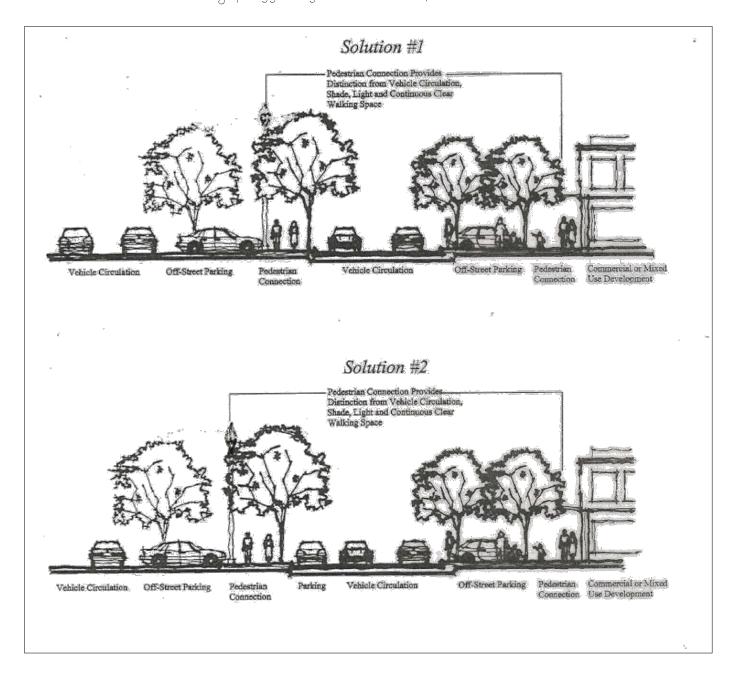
Examples of shopping streets used to meet the block layout standards and the building orientation standards when a full street connection cannot be met. Note: The above driveways do not have to extend through to Highway 33, provided that a pedestrian connection is made to the required sidewalk or multi-use path.
